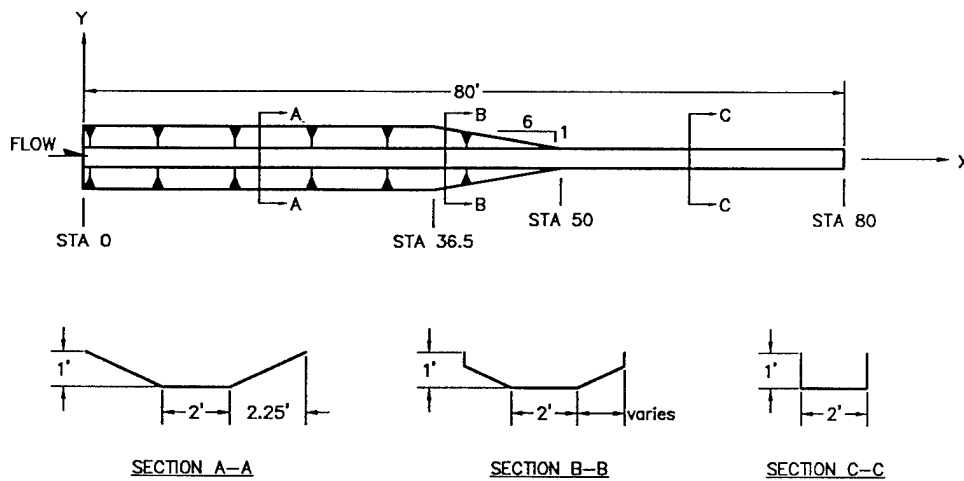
Plan view and sections of trapezoidal-to-rectangular transition.
